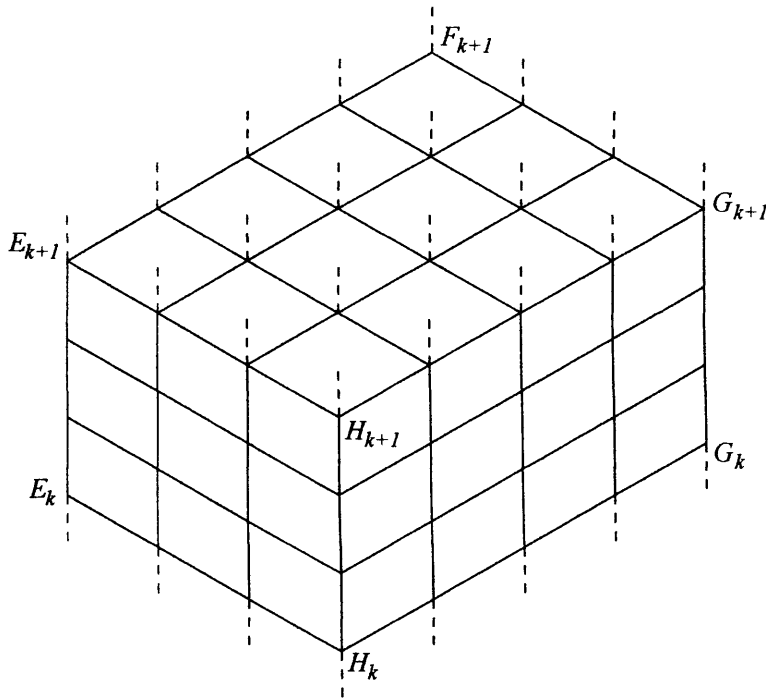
Typical floor plan of a symmetric three-dimensional frame structure
